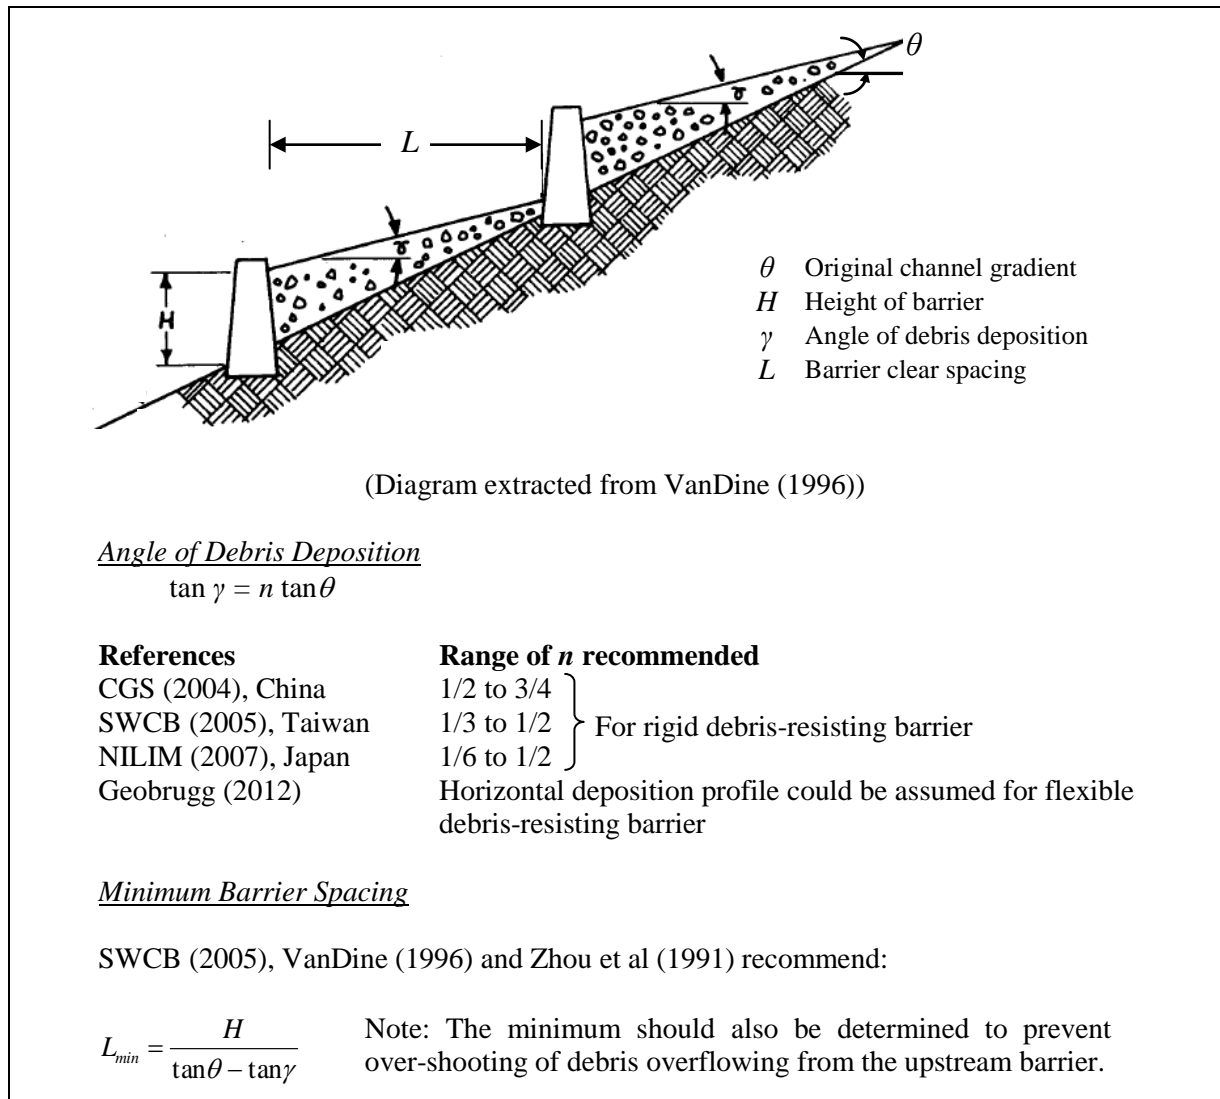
Debris Deposition Profile and Minimum Spacing of Barriers
